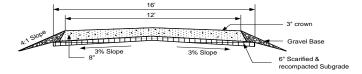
is a cross section schematic of the road bed, designed with a crown.
